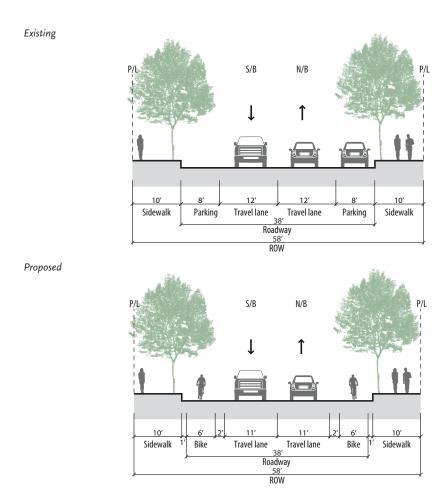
Typical Cross-Section for Vermont Avenue, Ada Avenue to Route 66.
